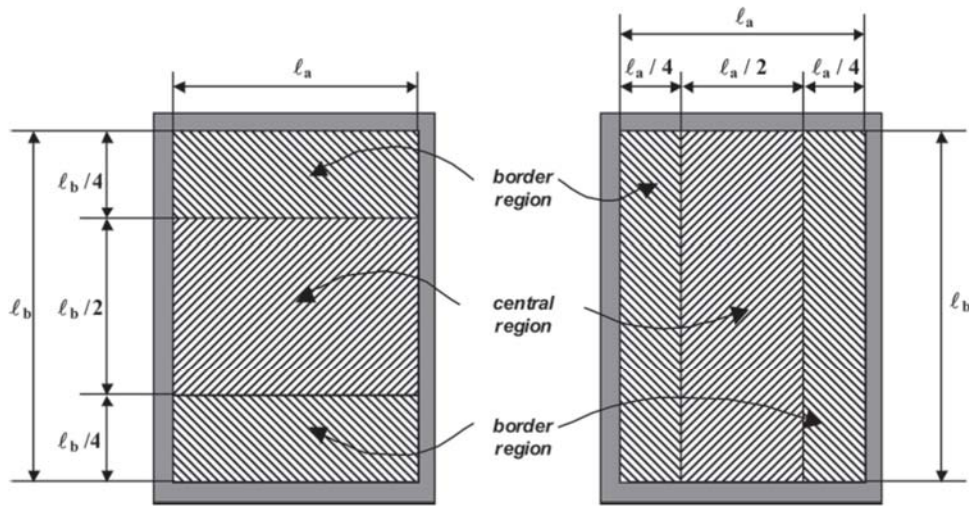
Central and border regions for two-way slabs supported on girders, beams, or reinforced concrete walls.
